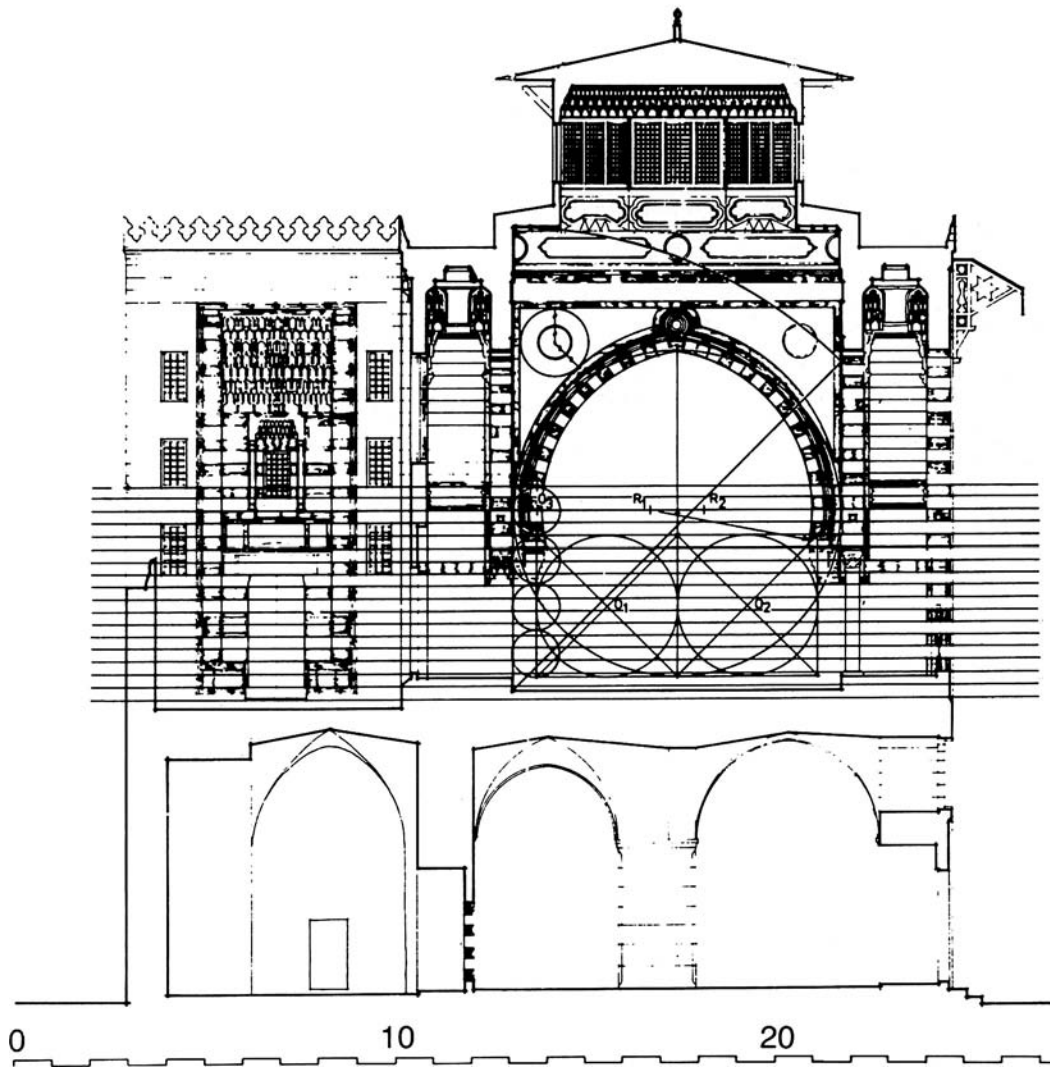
West-east section looking north (restored), after A.G. Walls
